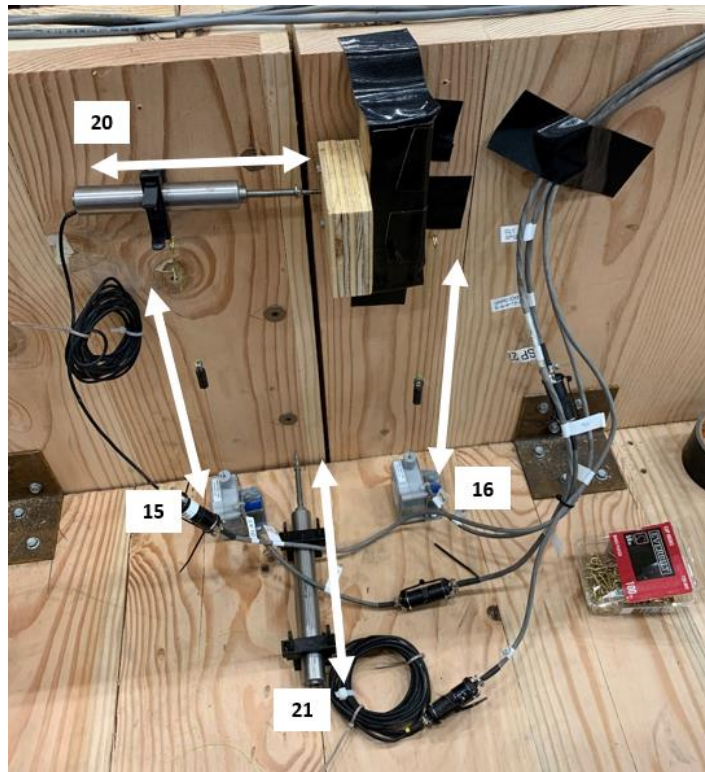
Panel-to-Panel Connection Instrumentation on Floor Diaphragm
